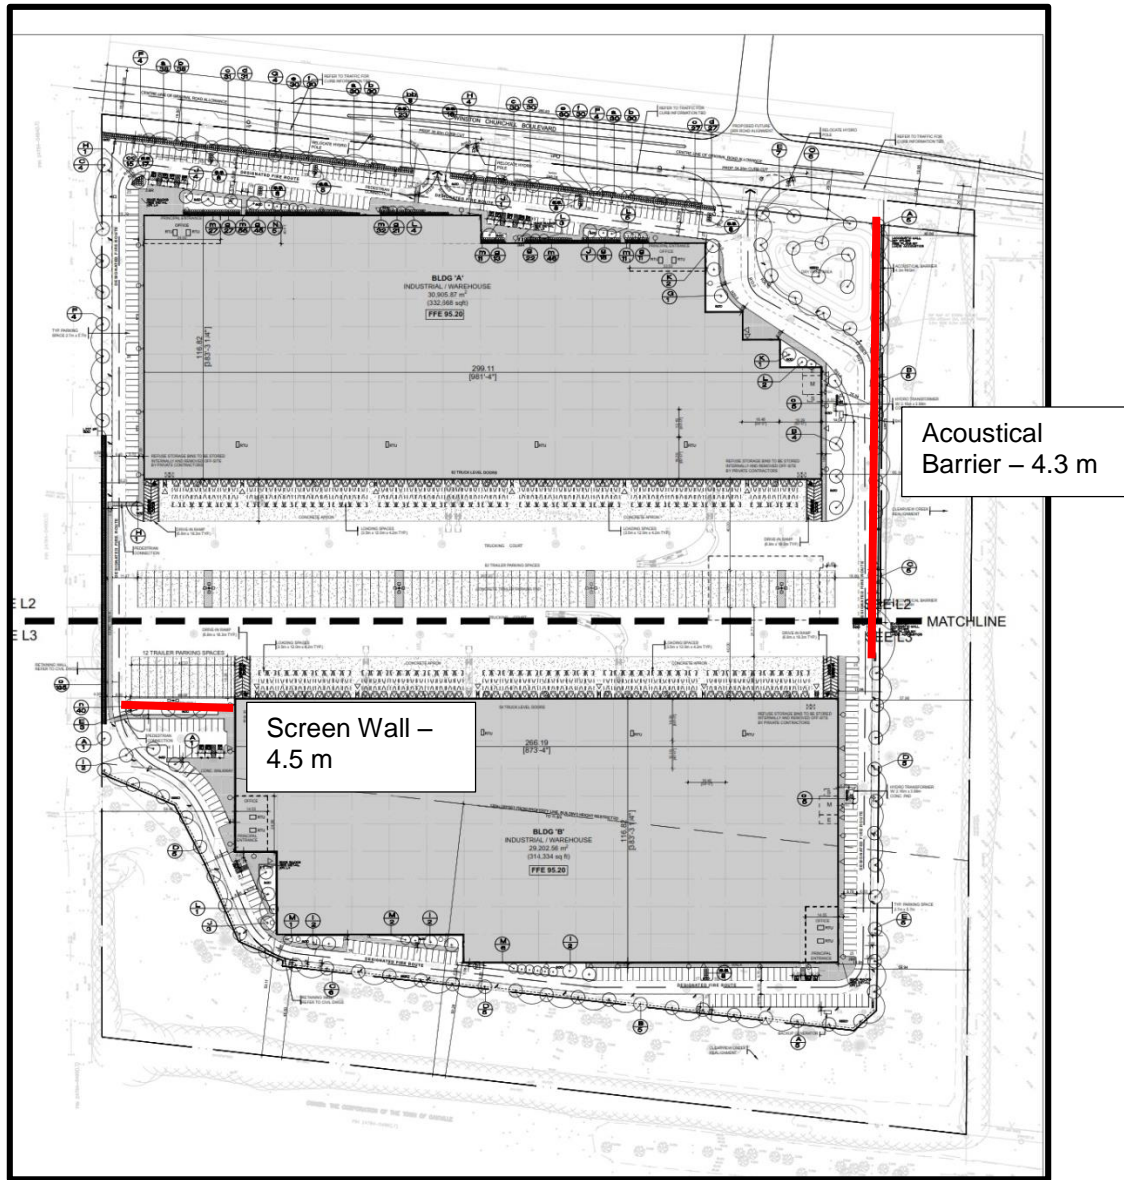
Landscape Plan 700/750 Winston Churchill Blvd.
